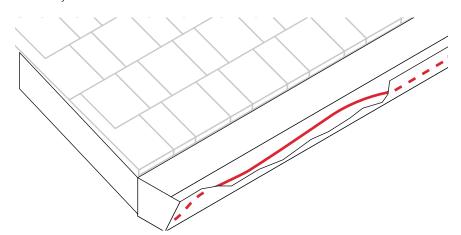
Layout in standard gutters - up to 6" (16 cm) wide
